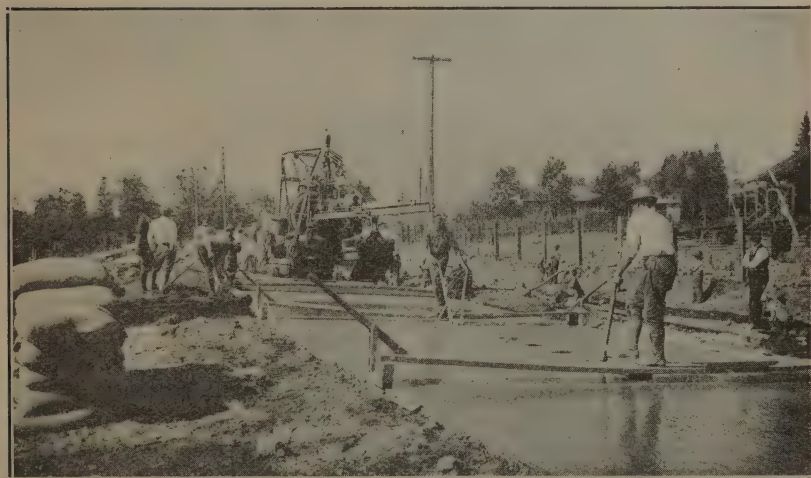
Plate VIII. State Highway, Siskiyou County, concrete base under construction.
